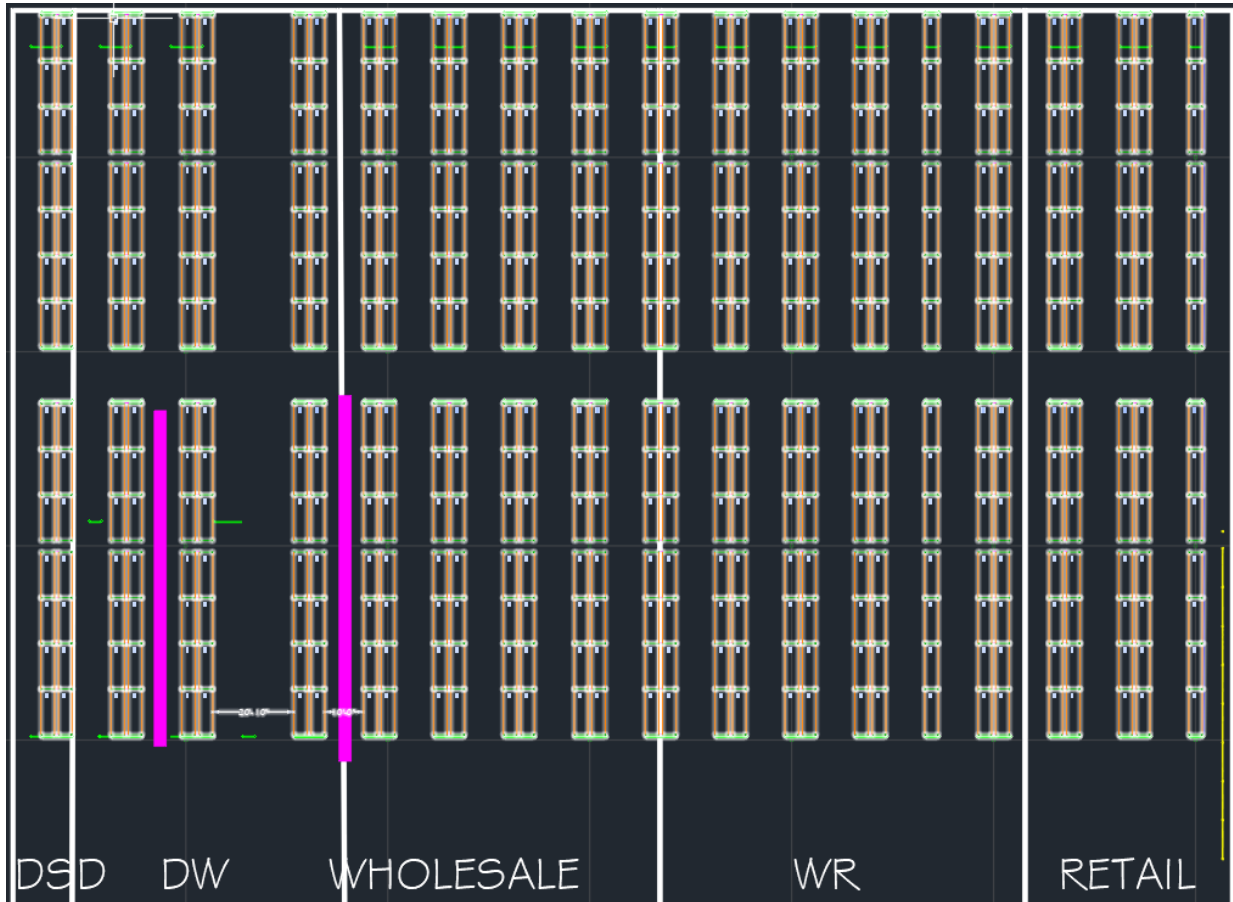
AutoCAD Drawing with Racking, Walls, Aisles, and Zones
